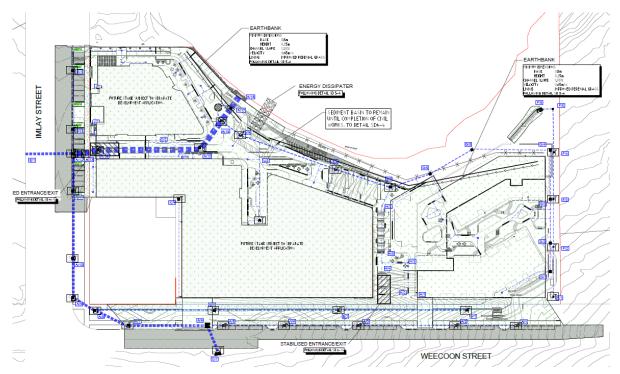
PROPOSED SOIL AND WATER MANAGEMENT PLAN:
